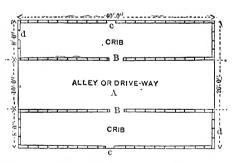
Ground Plan—A, Position of Sheller; B B, Doors for Feeding Sheller; d d, Doors for Feeding to Horses, &c.; c c, Doors for Shafting and Feeding.
